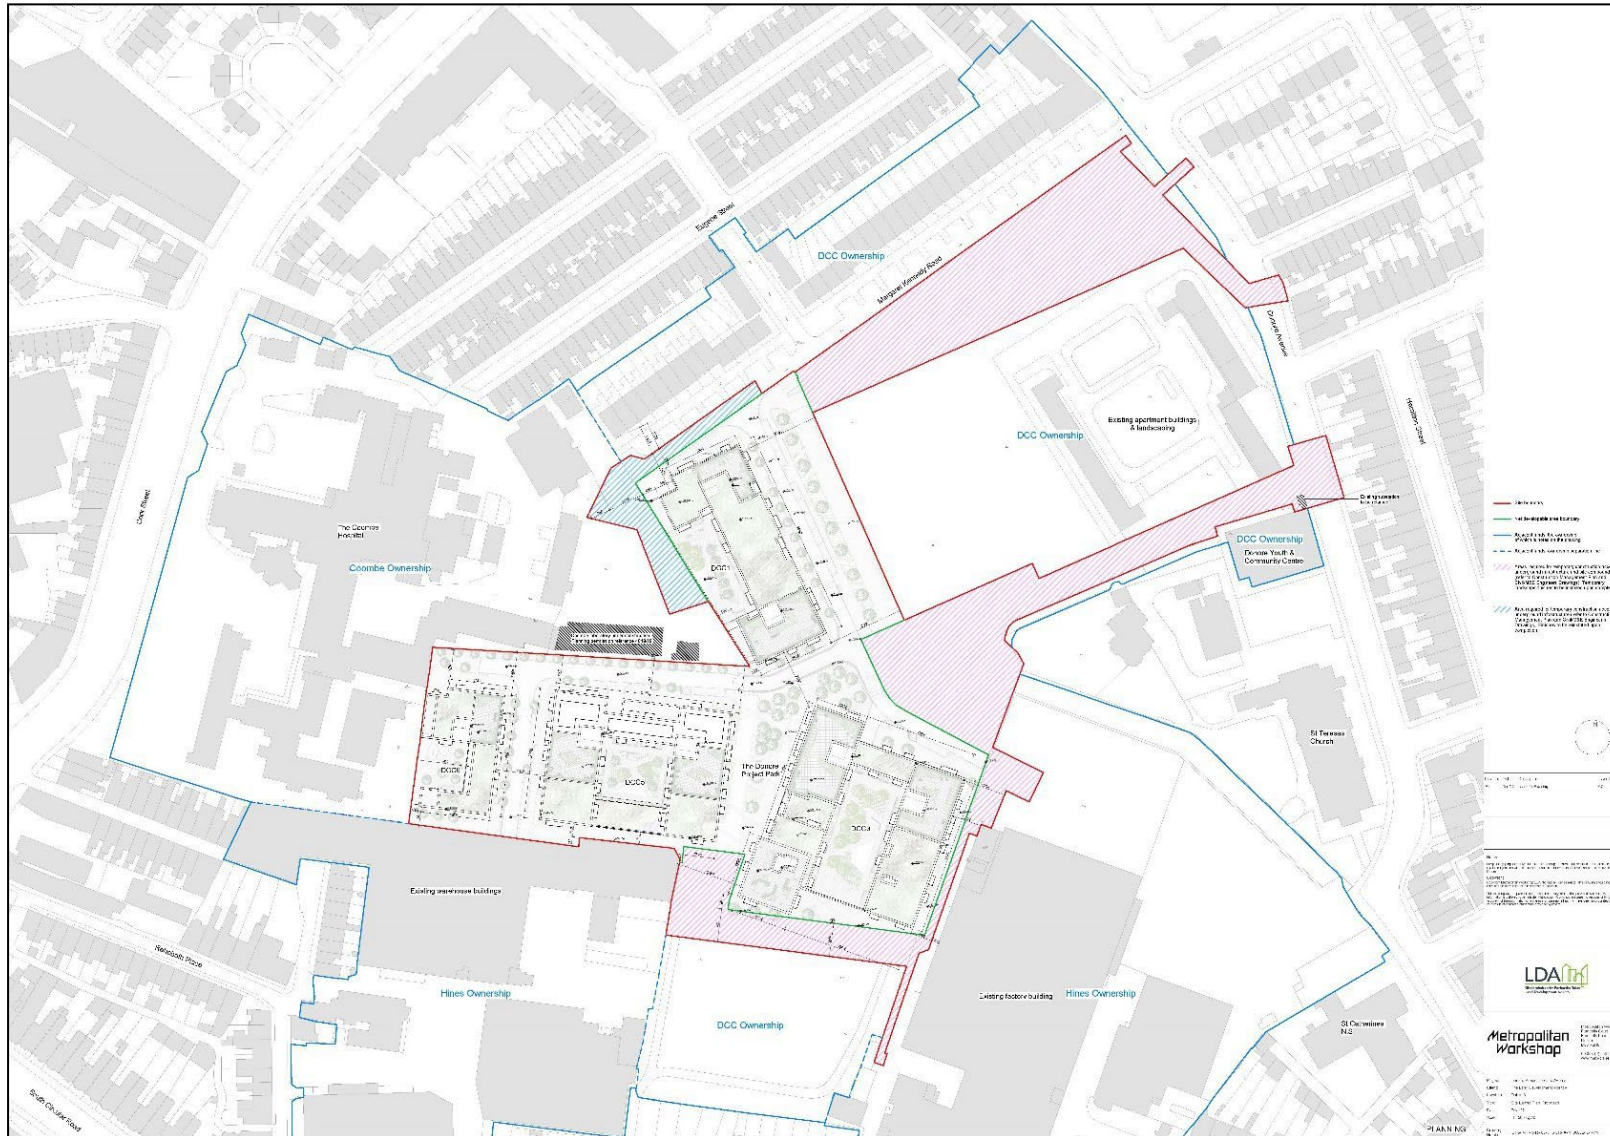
Proposed Site Layout Plan (Drawing number STG-MW-S1b-00-XX-DR-A-1100002-Site Layout Plan\_Proposed-S4-P1, Metropolitan Workshop)
